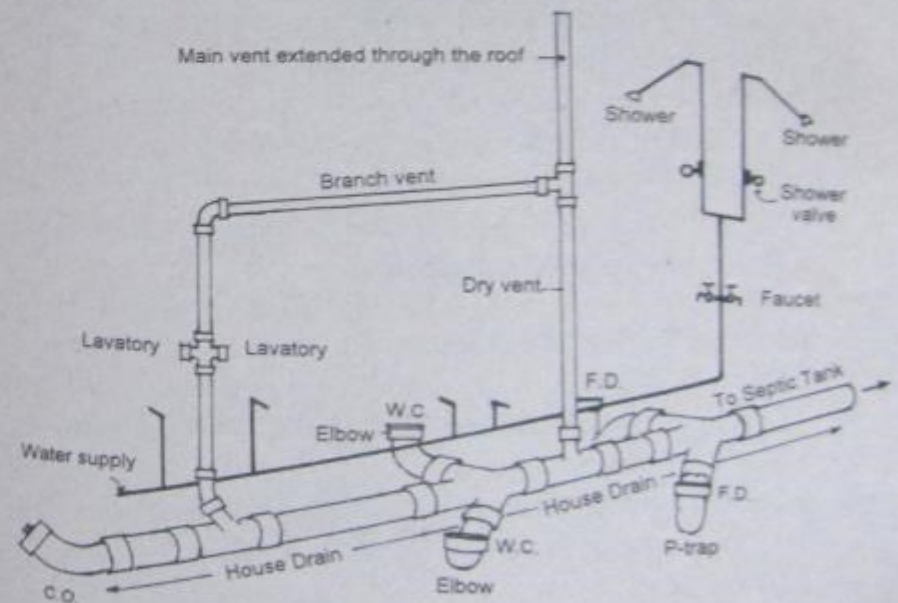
BACK TO BACK SINGLE UNIT TOILET
